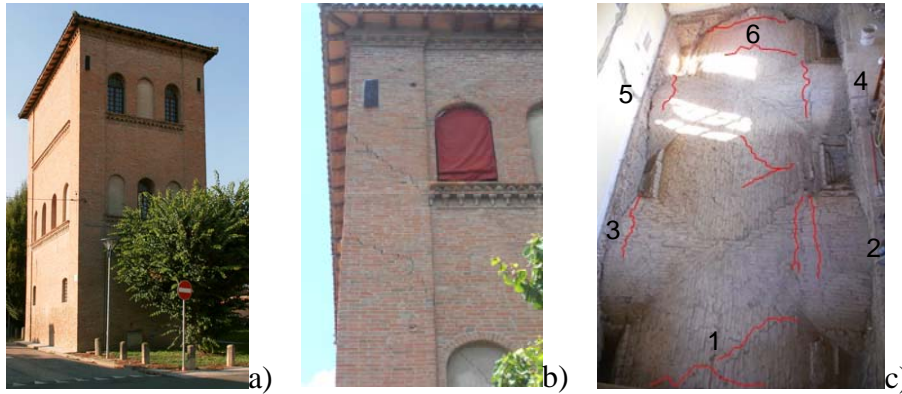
a) An external view of the Tower before earthquake; b) a detail of diagonal cracks on the East wall corner; c) a view of the crack patterns on the vaults extrados.
